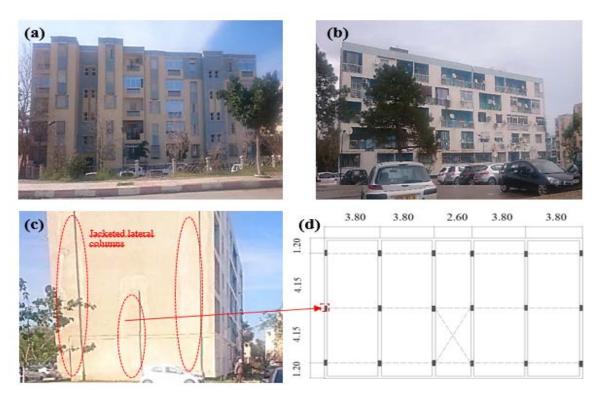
Residential buildings in Ibn Khaldoun area (a) New mid-rise RC shear wall buildings,
